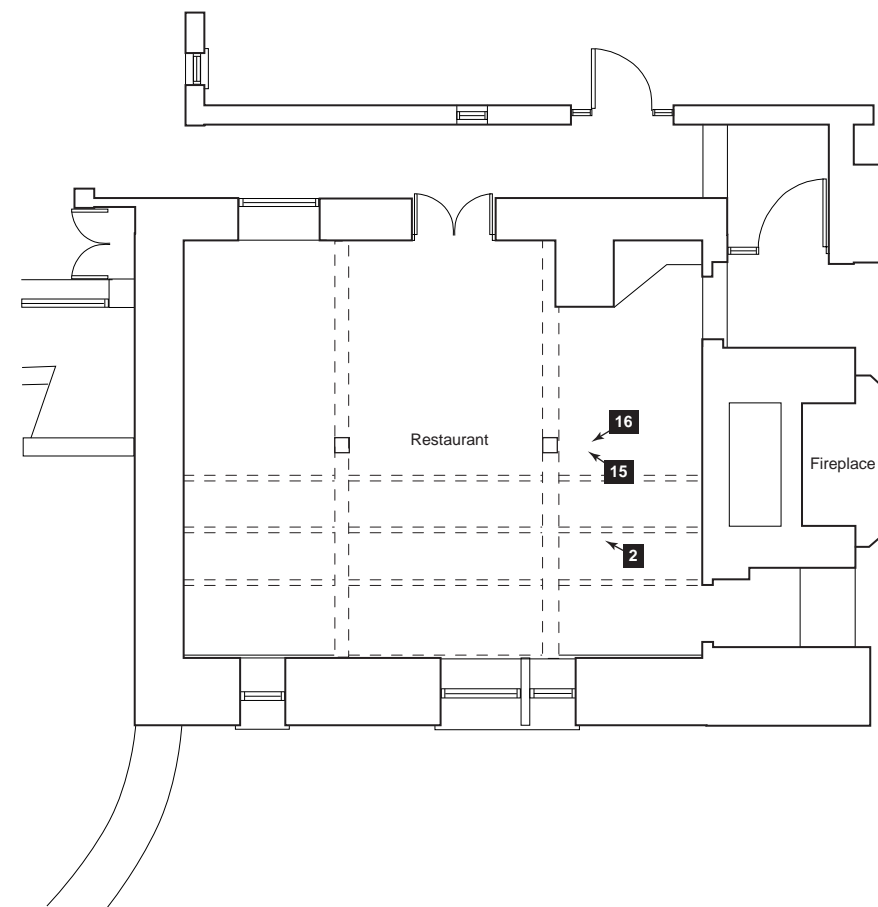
Ground floor plan, with area of works outlined (courtesy of Mann Williams)
